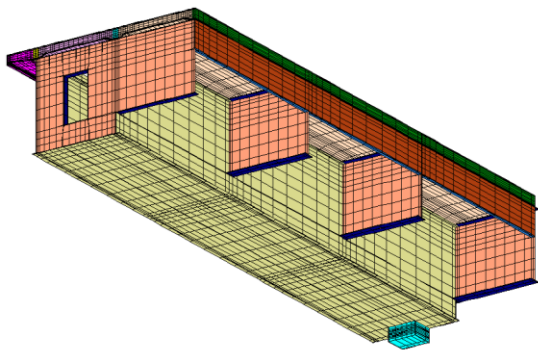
(a) 1/4th single span FEM bridge model considering the same structural components of Shinkesen Ohashi Bridge.
